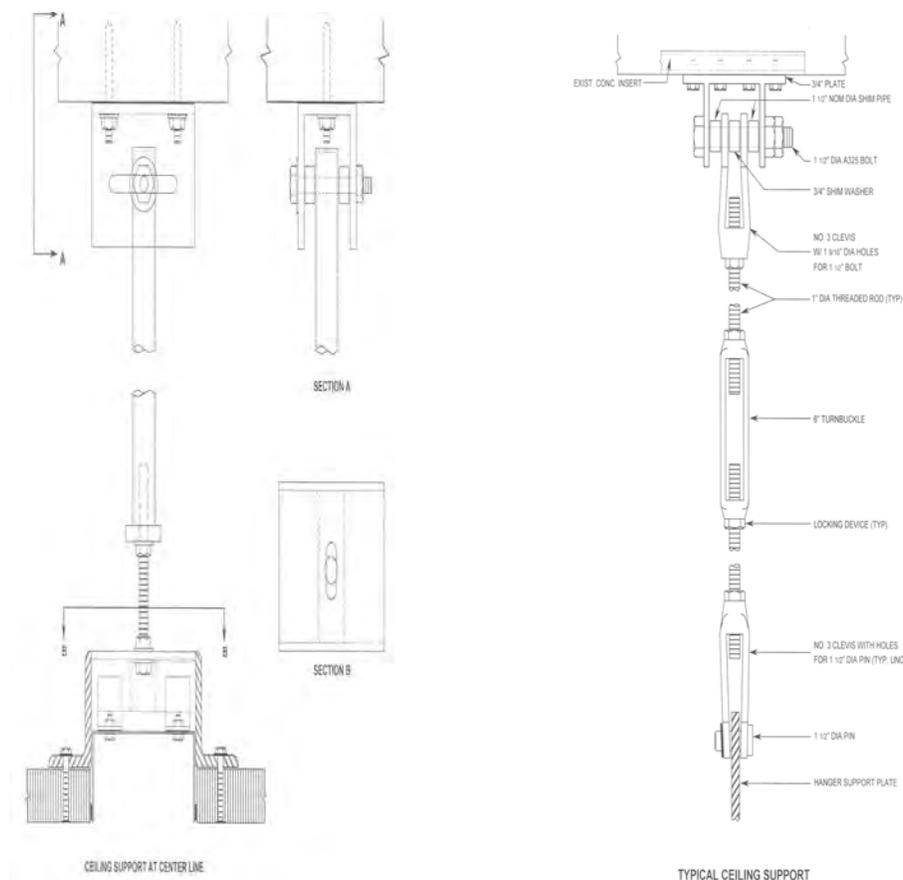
Typical Hanger Supports for Suspended Ceiling
